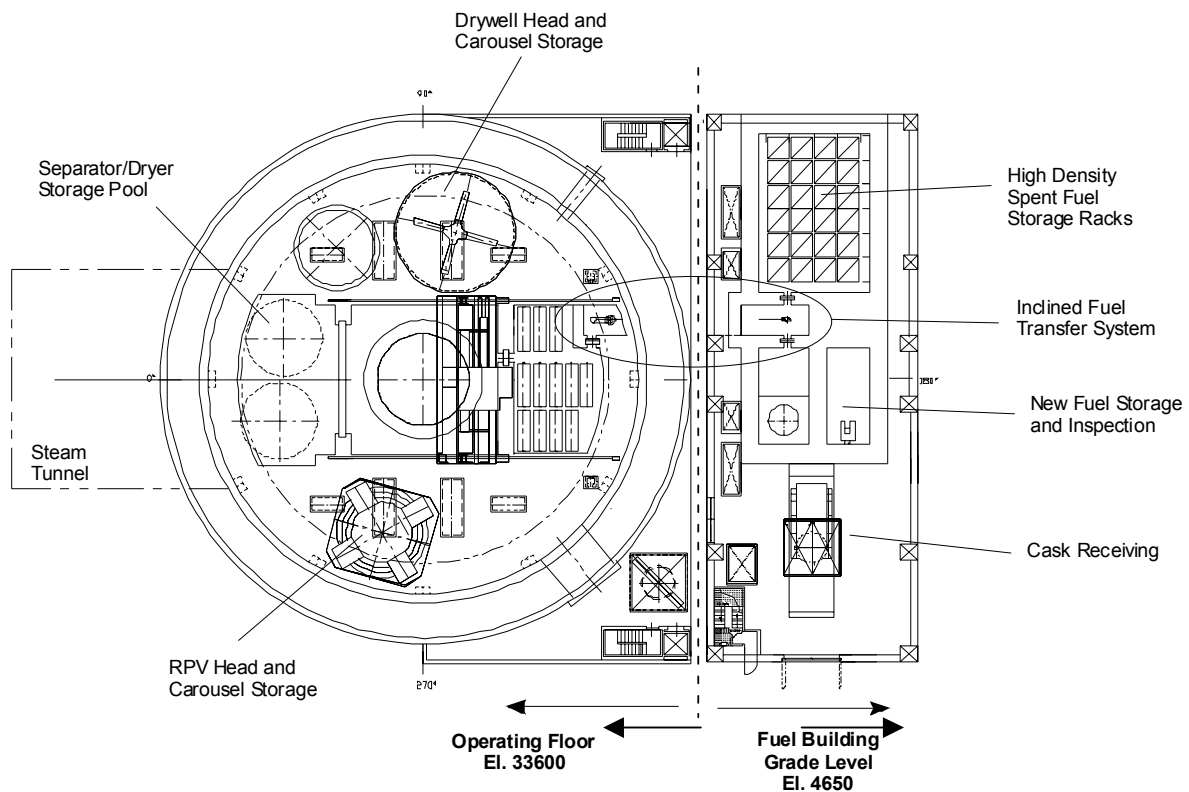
ESBWR reactor building arrangement, operating floor, elev. 33600 mm.
